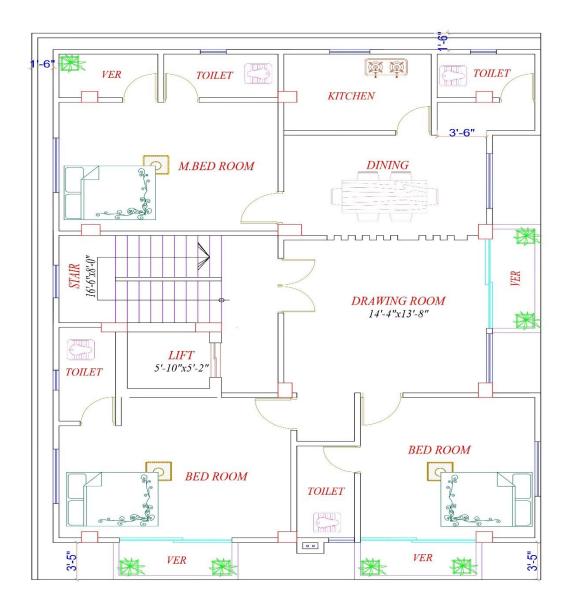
Typical Floor Plan (1st Floor 5th Floor)
